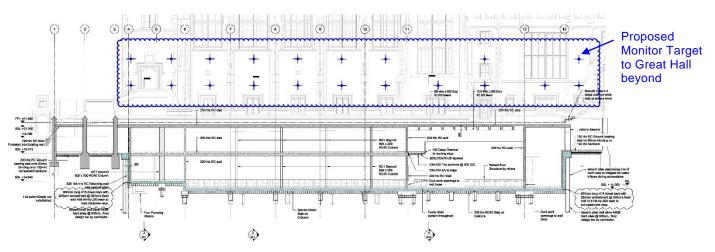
Section showing proposed monitoring targets on the Great Hall East Elevation
